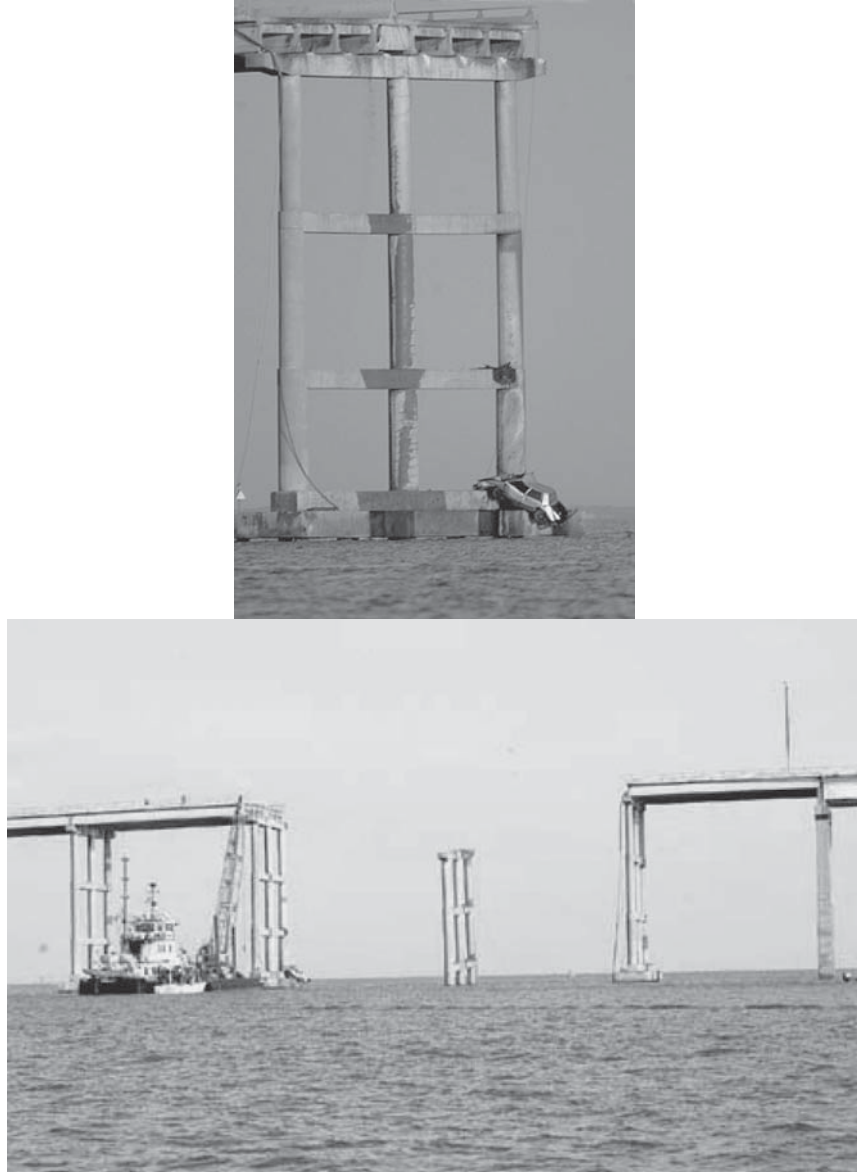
Collapse of Queen Isabella Causeway Bridge in Texas in 2001 when pier was struck by a barge.
